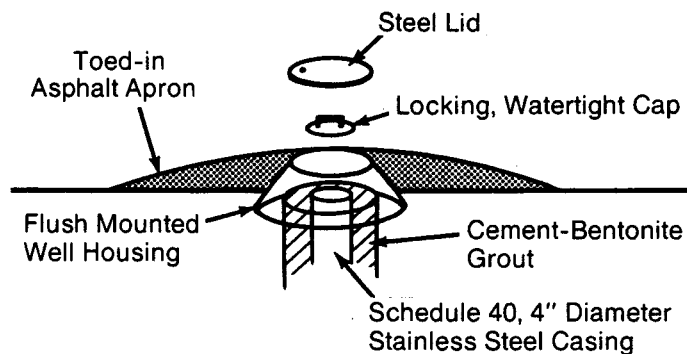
SHALLOW-BEDROCK MONITORING WELL CONSTRUCTION DETAILS (TYPICAL)
